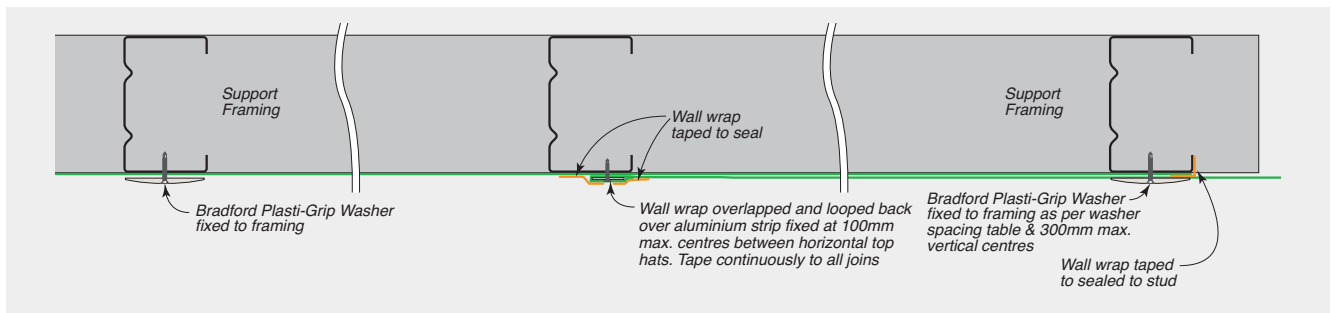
Vertical Wall Wrap Junction – At Control Joint
